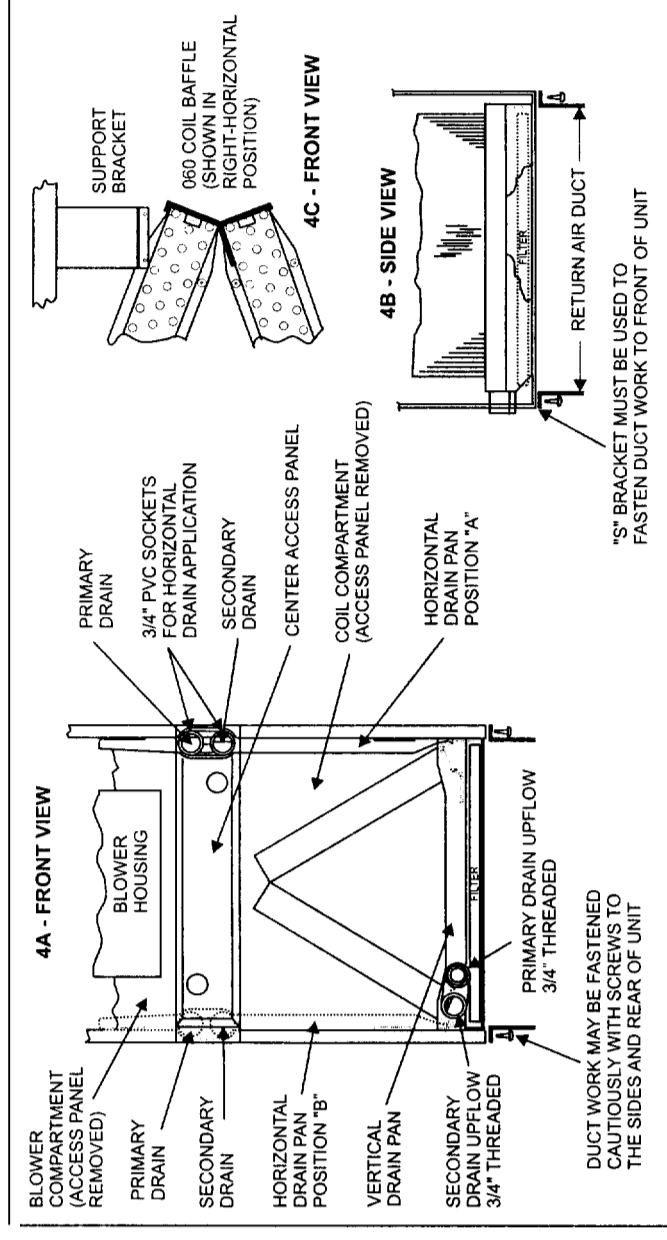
Filter Access & Drain Pan Conversion / Coil Baffle
